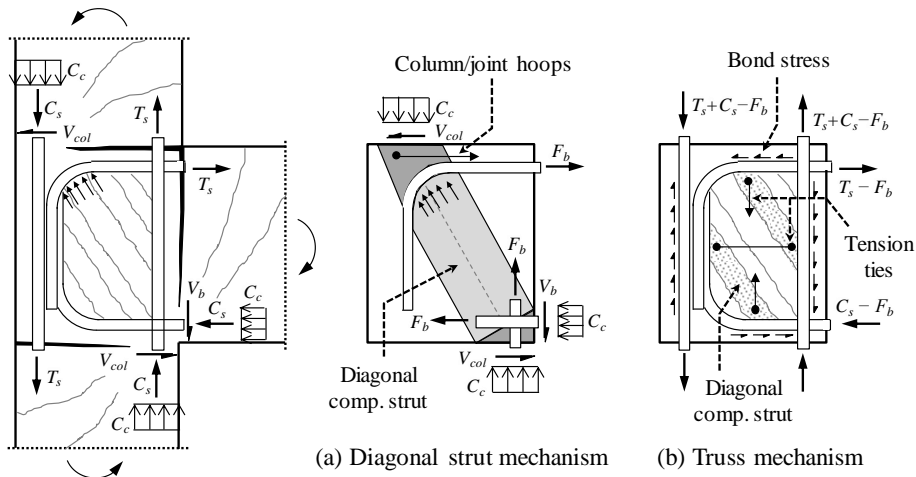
Force transfer mechanism in exterior beam-column joint
